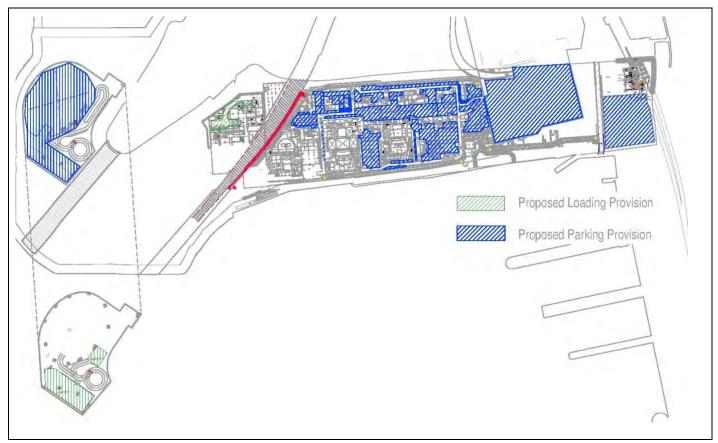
Level +9.35mPD Layout Plan – Ground Floor (Ultimate)
